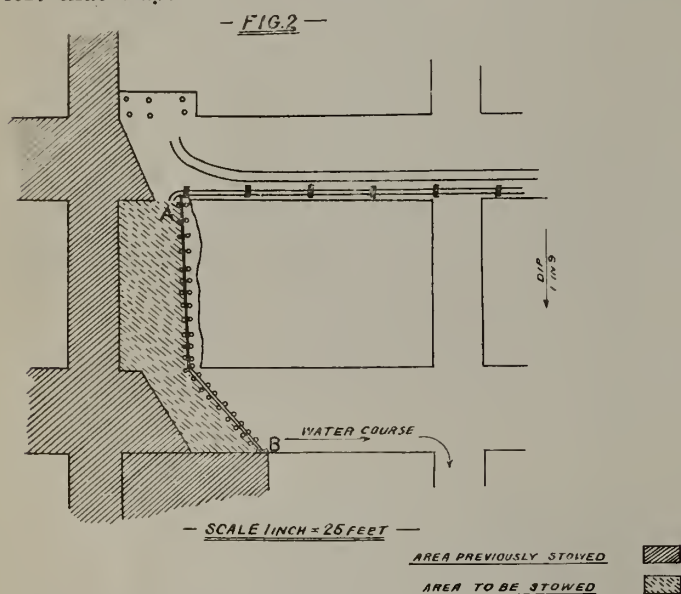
shows an enlarged view of a cut-through about to be stowed. The stowing material and water pour into excavated area at point "A," From there to point "B" two parallel rows of props are set about two inches apart with 3 ft. between each couple, one inch boards are placed between the two-inch space forming a wall from roof to pavement, and this wall is backed with bratticecloth. As the stowing material and water flow into the space, the solid material gradually settles and the water drains off through the bratticecloth and spaces in the boards, leaving after a day or two, a hard compact filling, through which roadways can be driven. After a few days the props, boards and brattice are withdrawn and are ready for further use. The water will run through the various crosscuts till it reaches the water level and finally the sump from which it is pumped back again to the surface. In the case of using sand very little trouble is experienced in clarifying the water. All that is necessary is to lend it into the bottom of a wooden tank letting it overflow into the sump. The tank can be cleaned out after flushing ceases. Where material of a clay nature is used for stowing a series of silt recovery boxes would be required.
